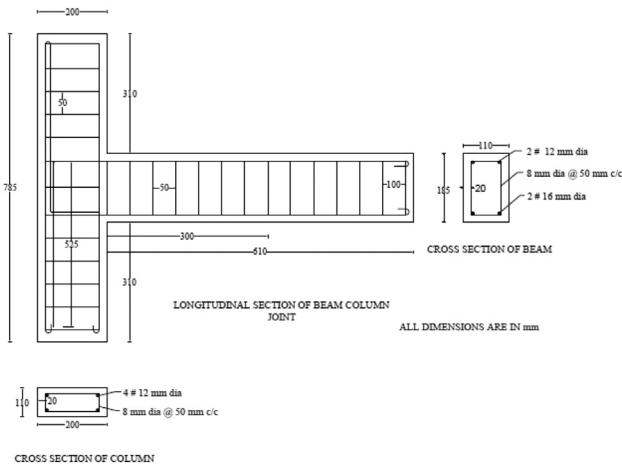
Reinforcement Detailing of Beam - Column Joint specimen.
